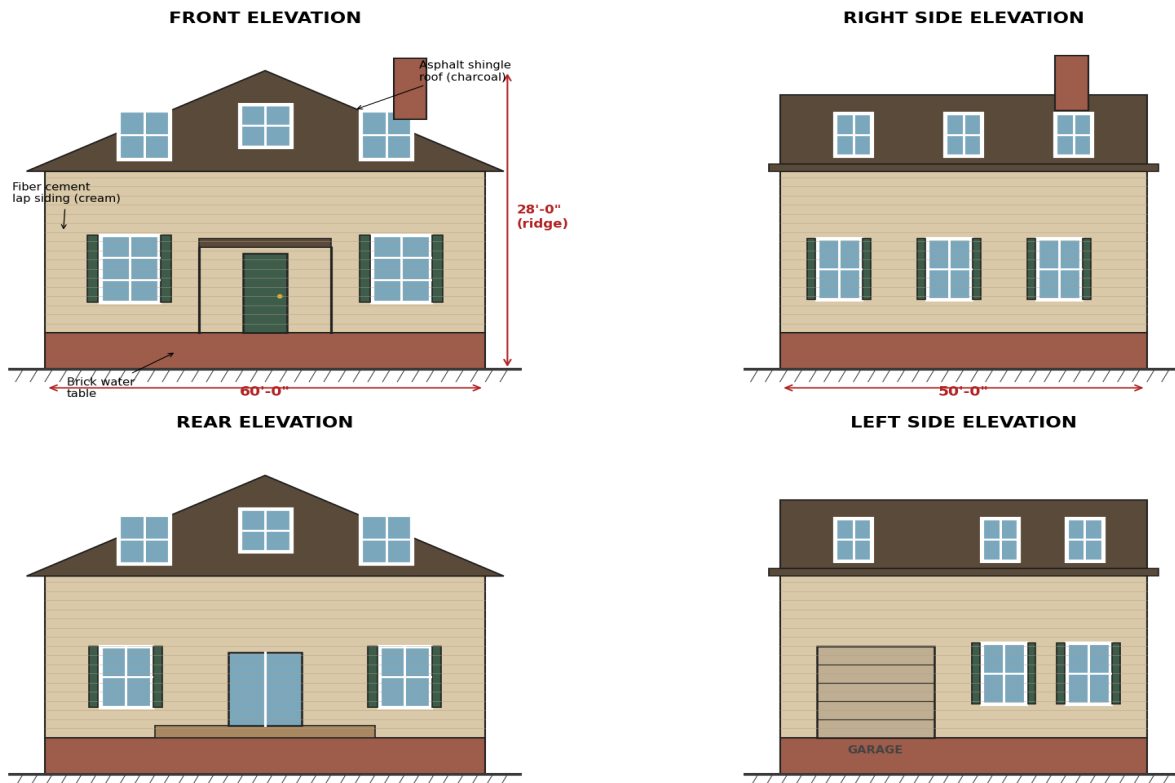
Example elevations for all four sides of the home, identifying exterior materials (fiber cement lap siding, brick water table, asphalt shingle roof) and the overall ridge height.
